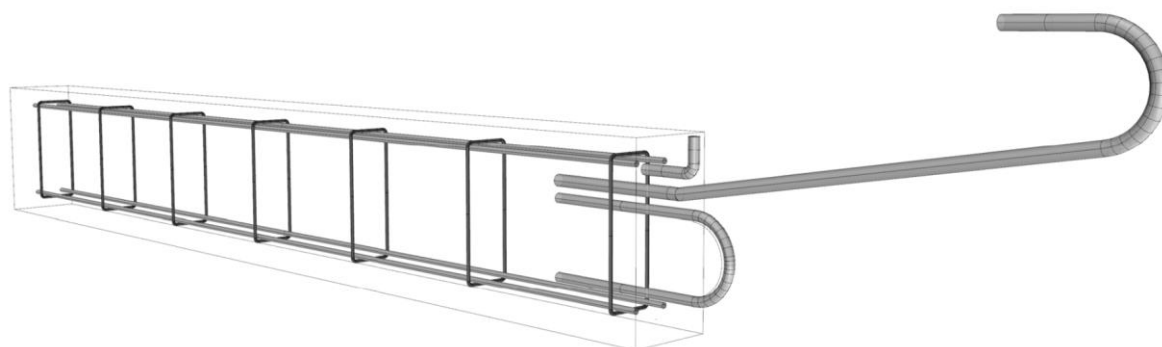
3D drawing of the concrete element including reinforcement and inserts.
